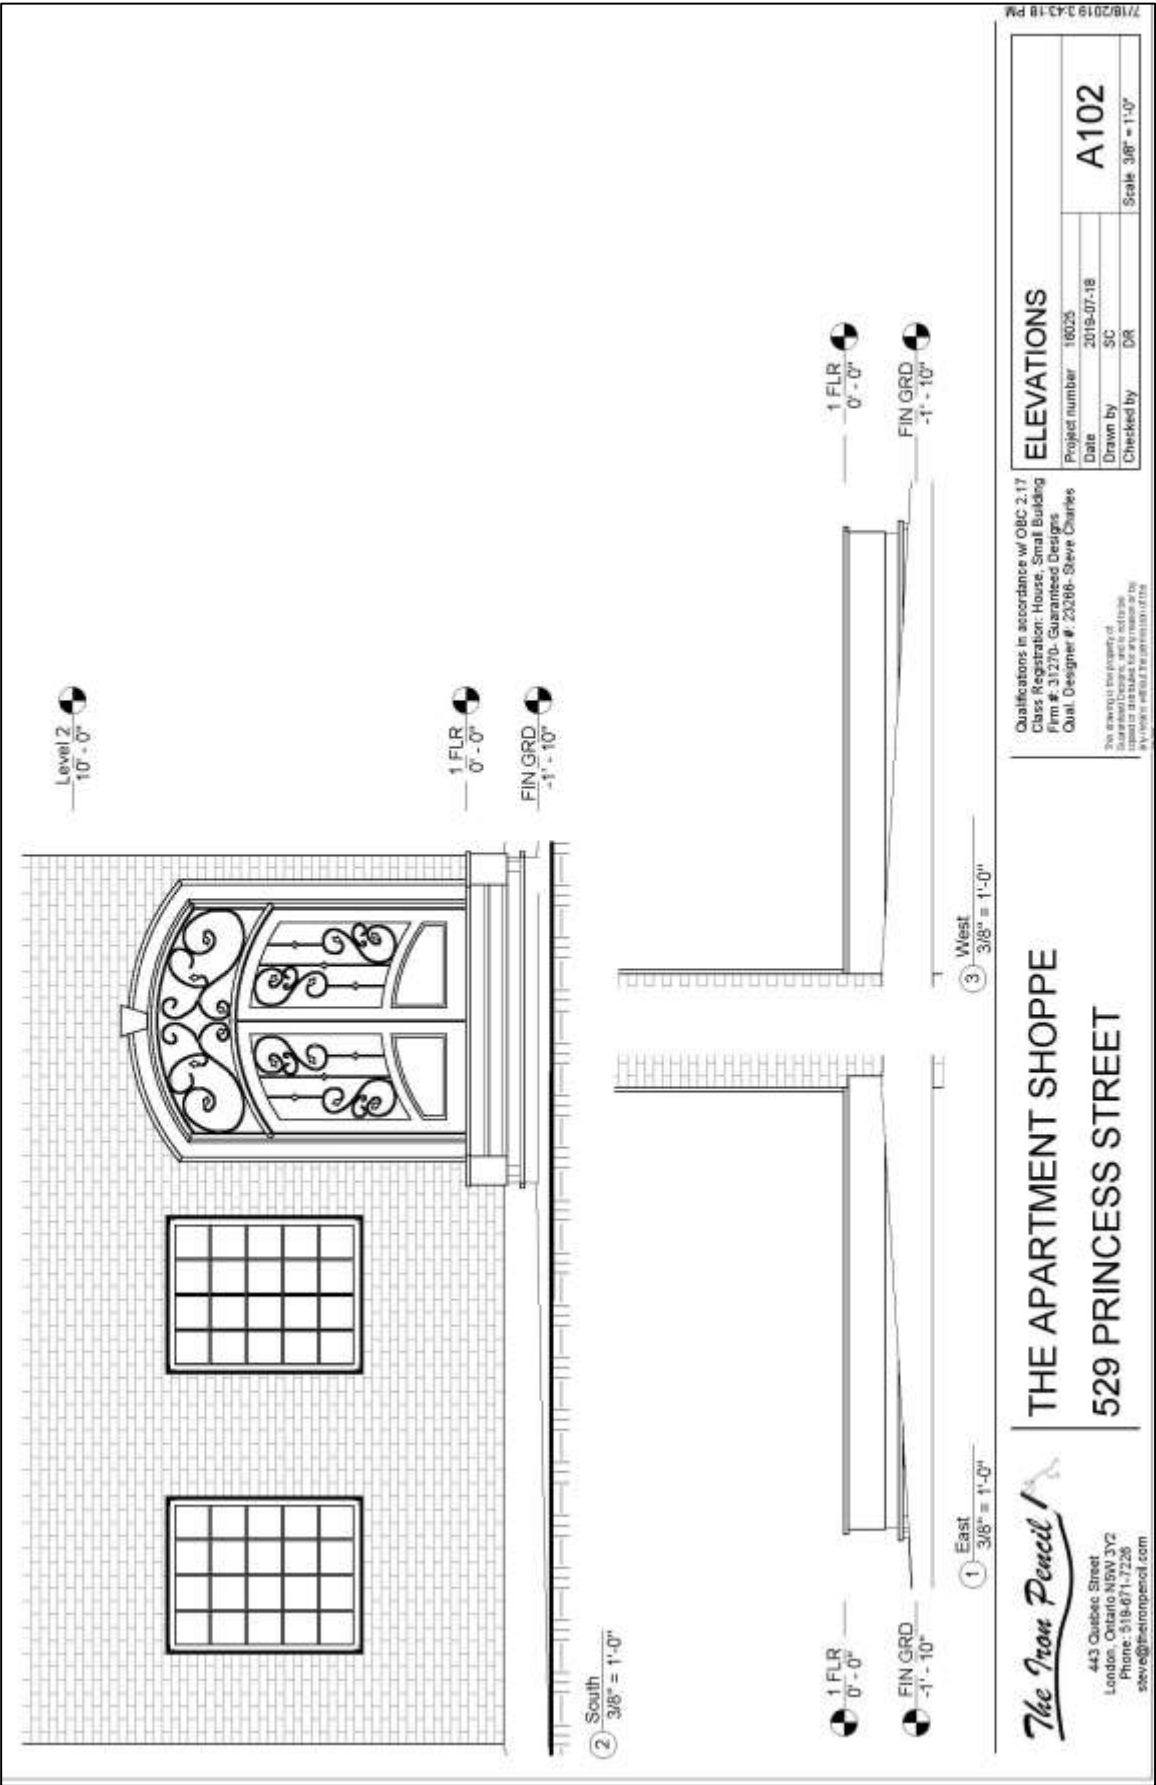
Drawing showing the existing porch of the dwelling at 529 Princess Avenue. Note the door and windows are not accurately depicted.
